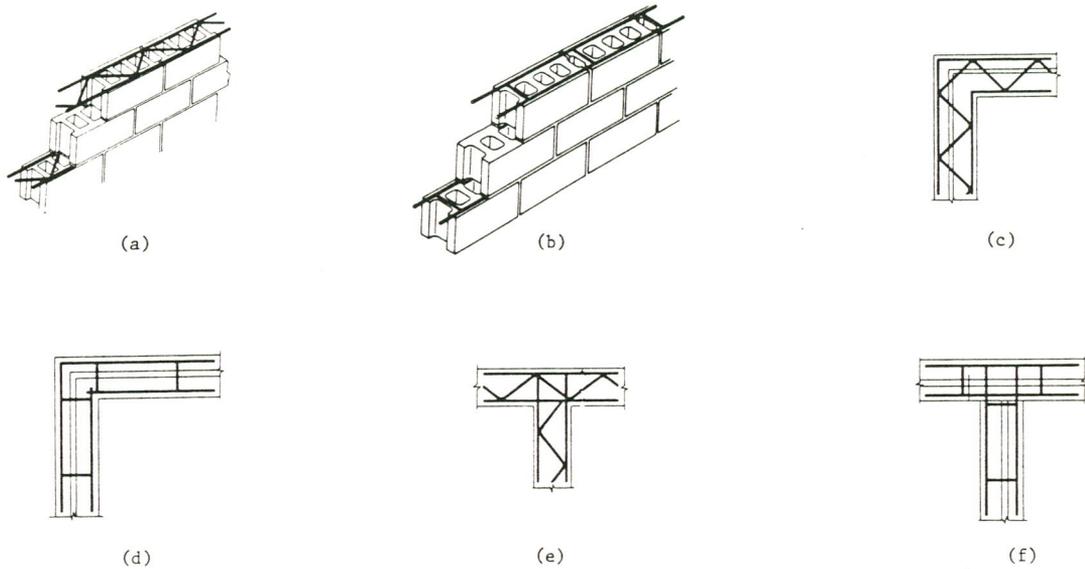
Horizontal reinforcement between intersection masonry walls: (a, b) without bond beams, (c,d) with bond beam (NBS, 1977)
